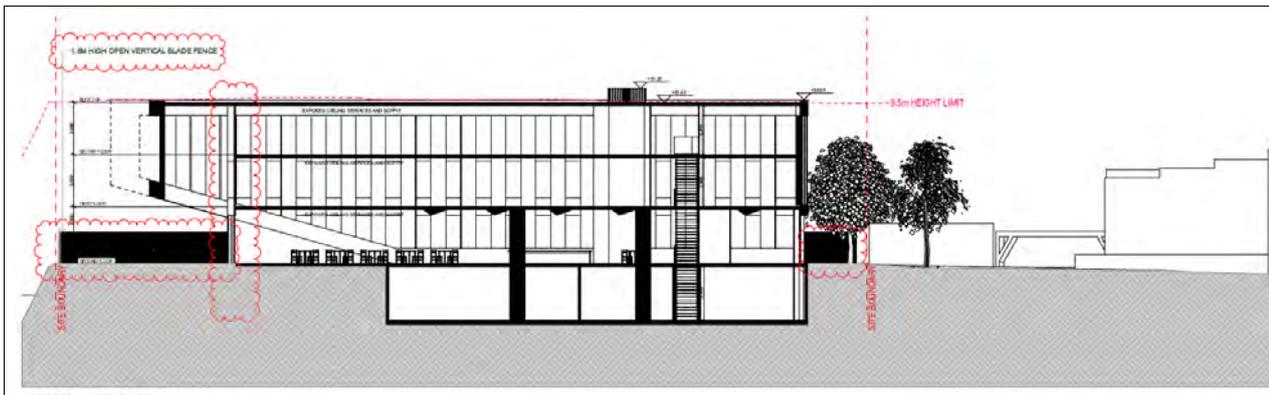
Section through proposed building (red line indicates maximum permitted building height)
